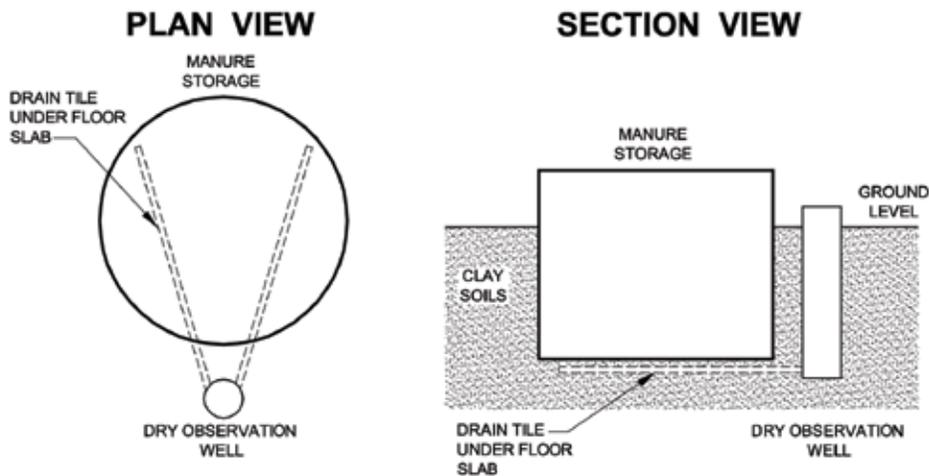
Leak Detection Under a Manure Storage Facility
